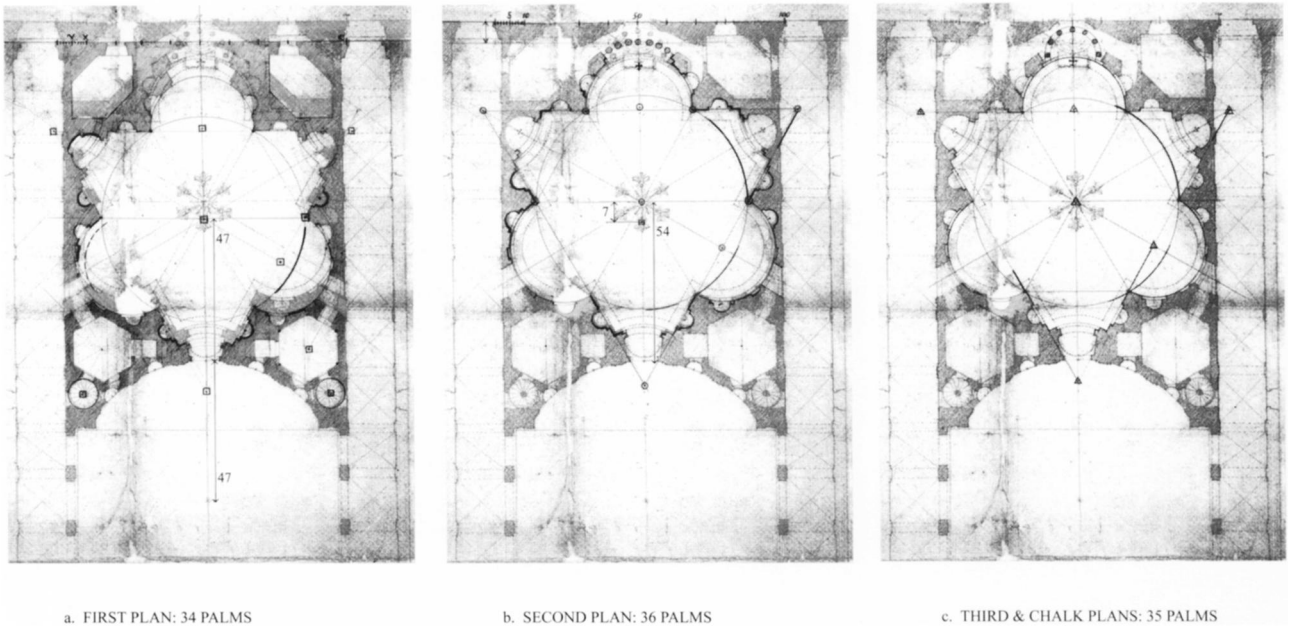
Borromini, detail of Archives plan, comparison of first, second, and third schemes
